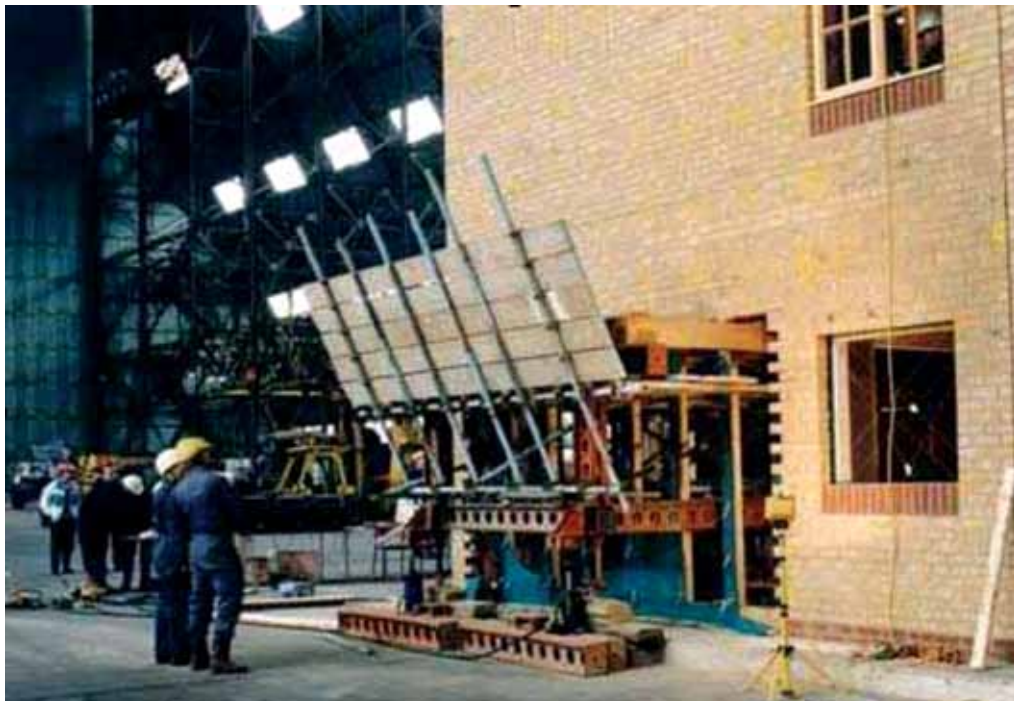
Disproportionate collapse test on TF2000 timber frame building
